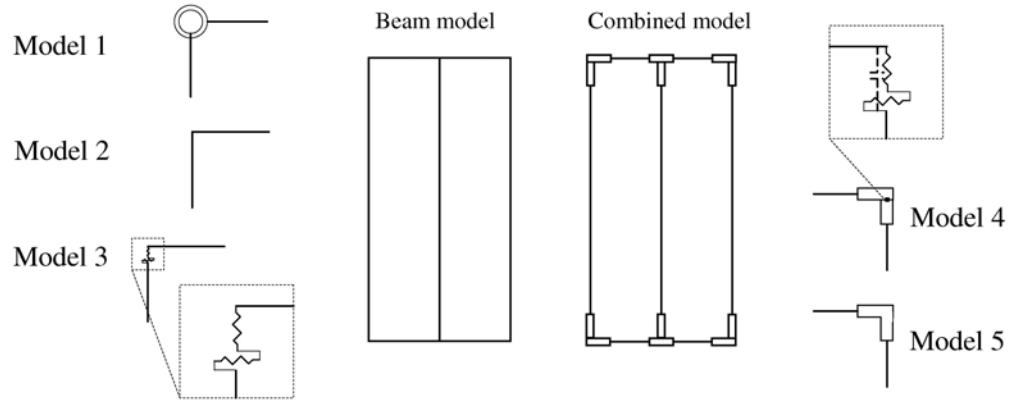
Illustration of alternative models of the framing and for the connections between timber members.
